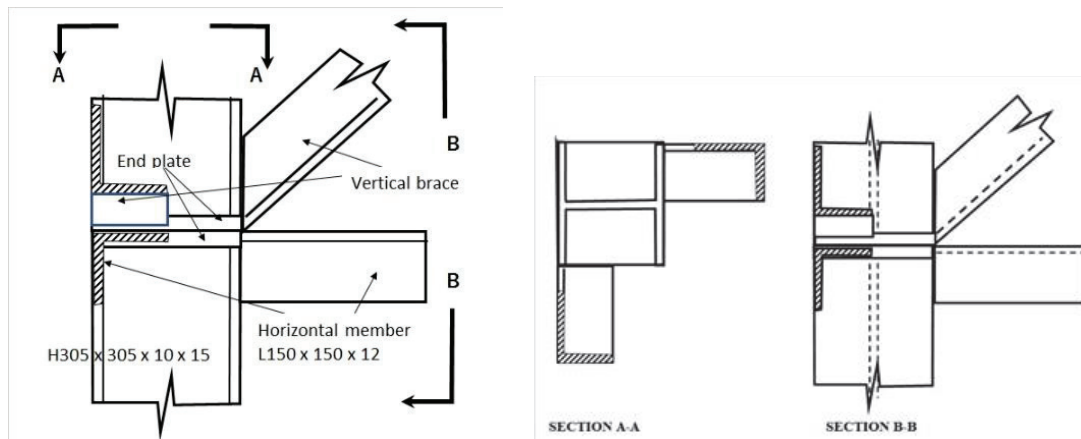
Detail of a joint of the actual tower-crane mast
